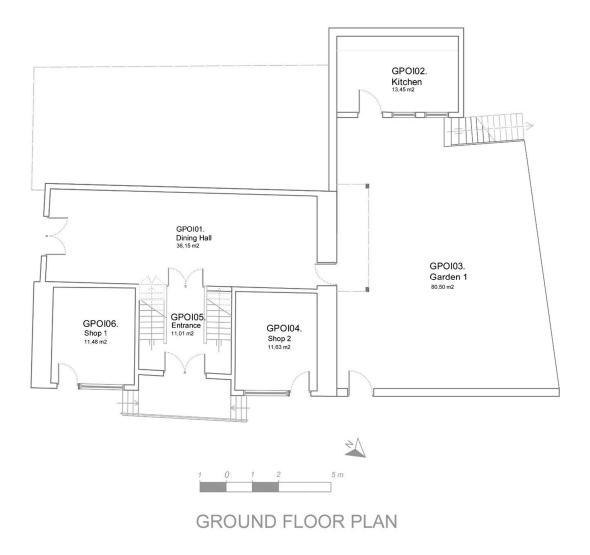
Post-intervention ground floor of Kadirler house (Author, 2023)
